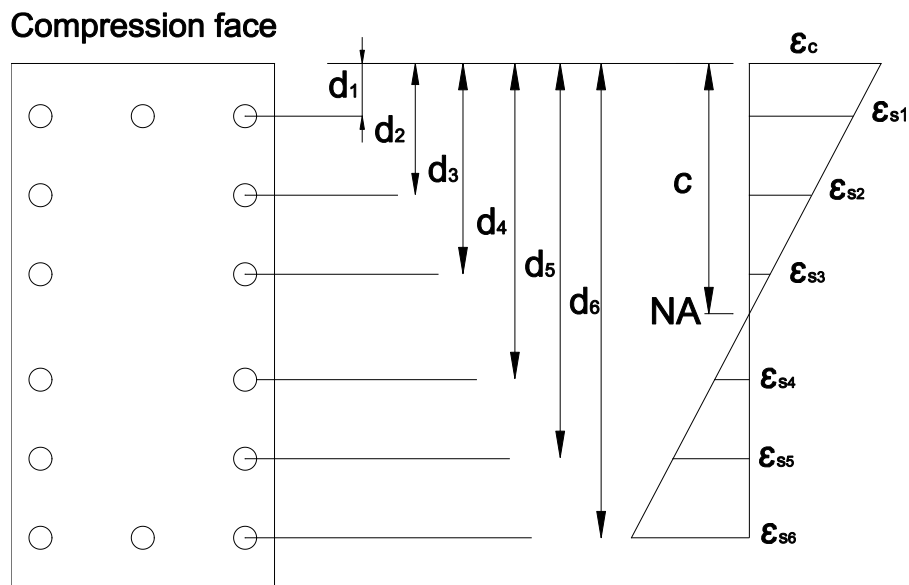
Distribution of strain over the depth of a rectangular reinforced concrete beam section
